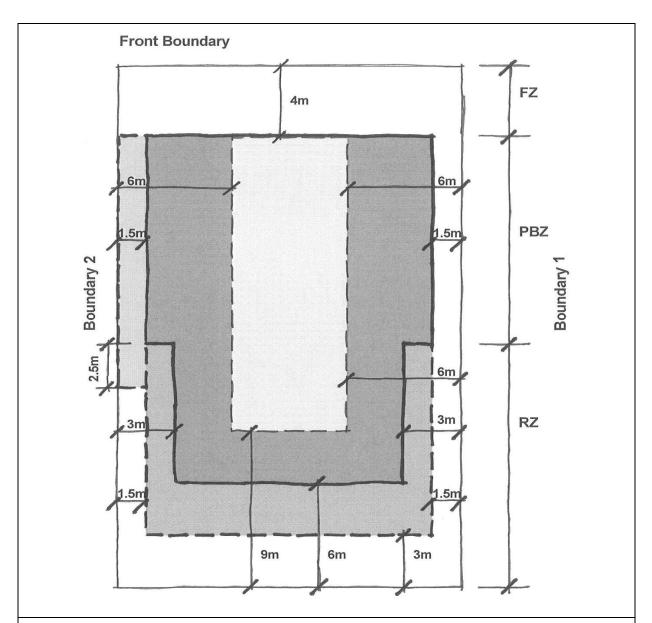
Setbacks - Alternative Option - East and west facing side boundaries
